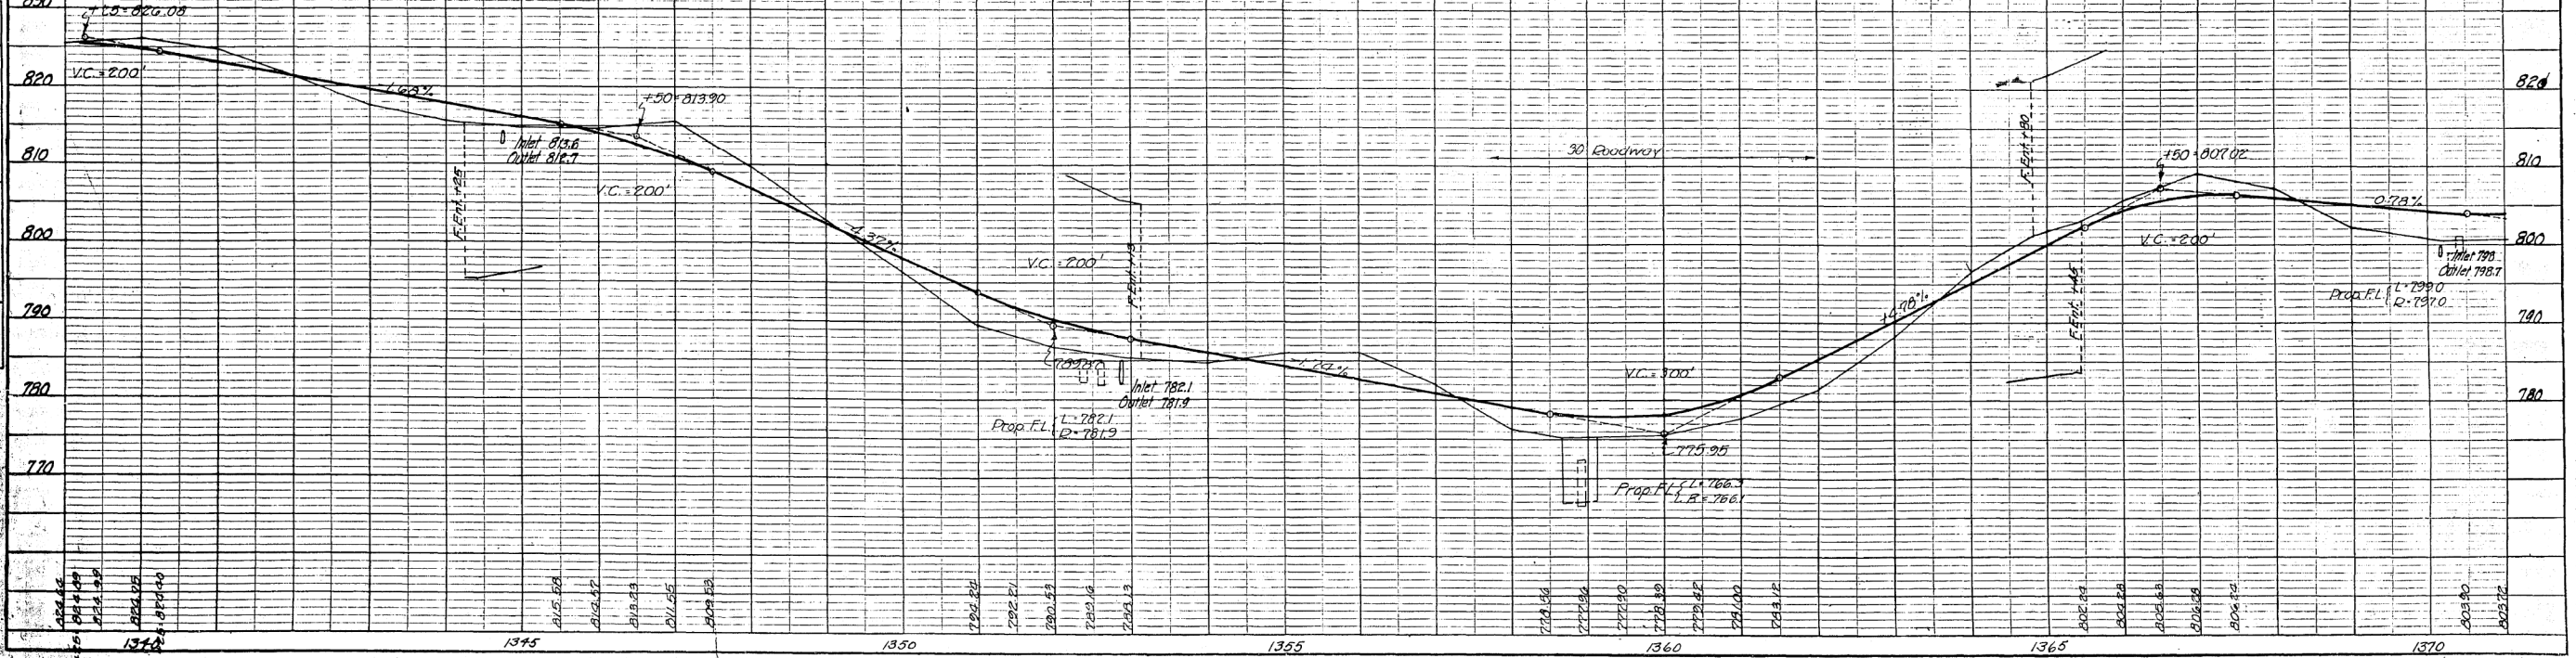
PLAN-PROFILE B. P. R. STANDARD
